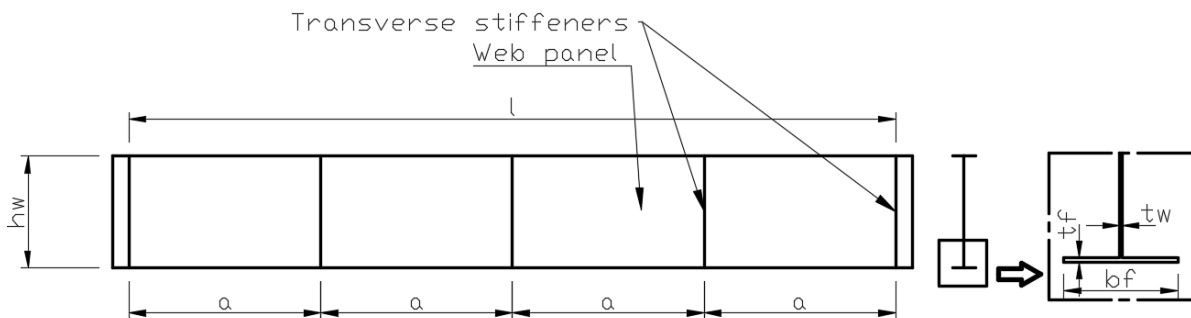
GENERAL BUILDUP OF A PLATE GIRDER
